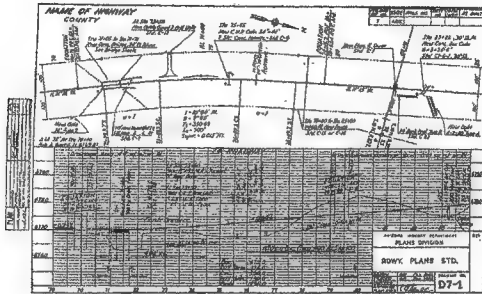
Typical sheet of plans for a 2-lane rural highway (Courtesy Arizona Highway Department)
